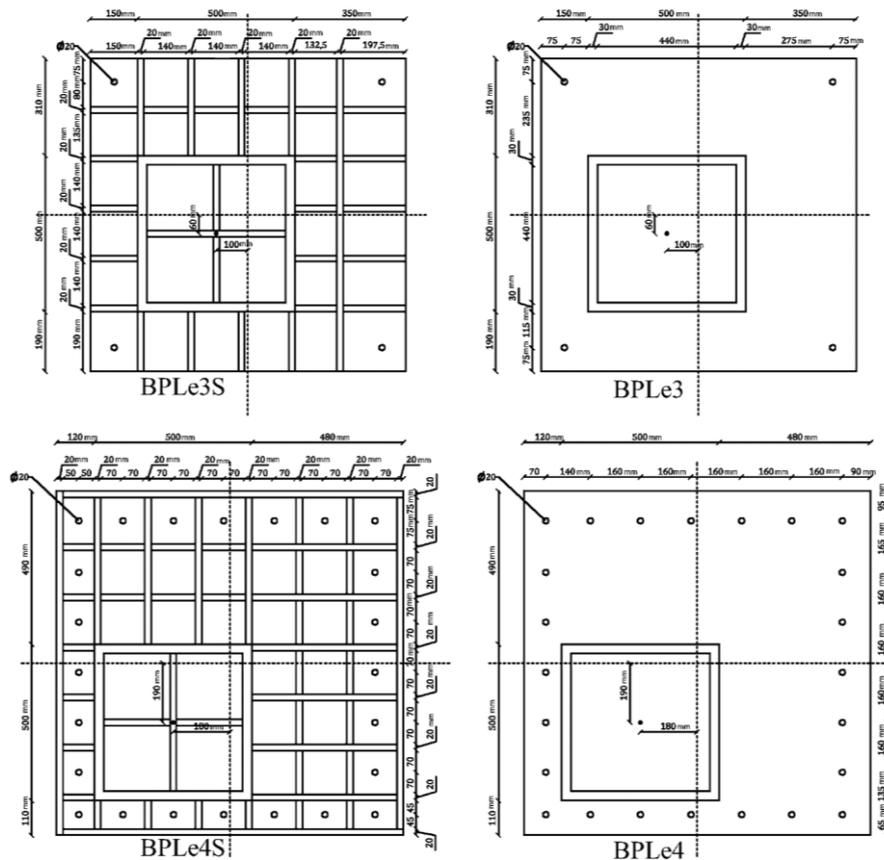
Plan of the designed specimens under a bi-directional eccentricities
